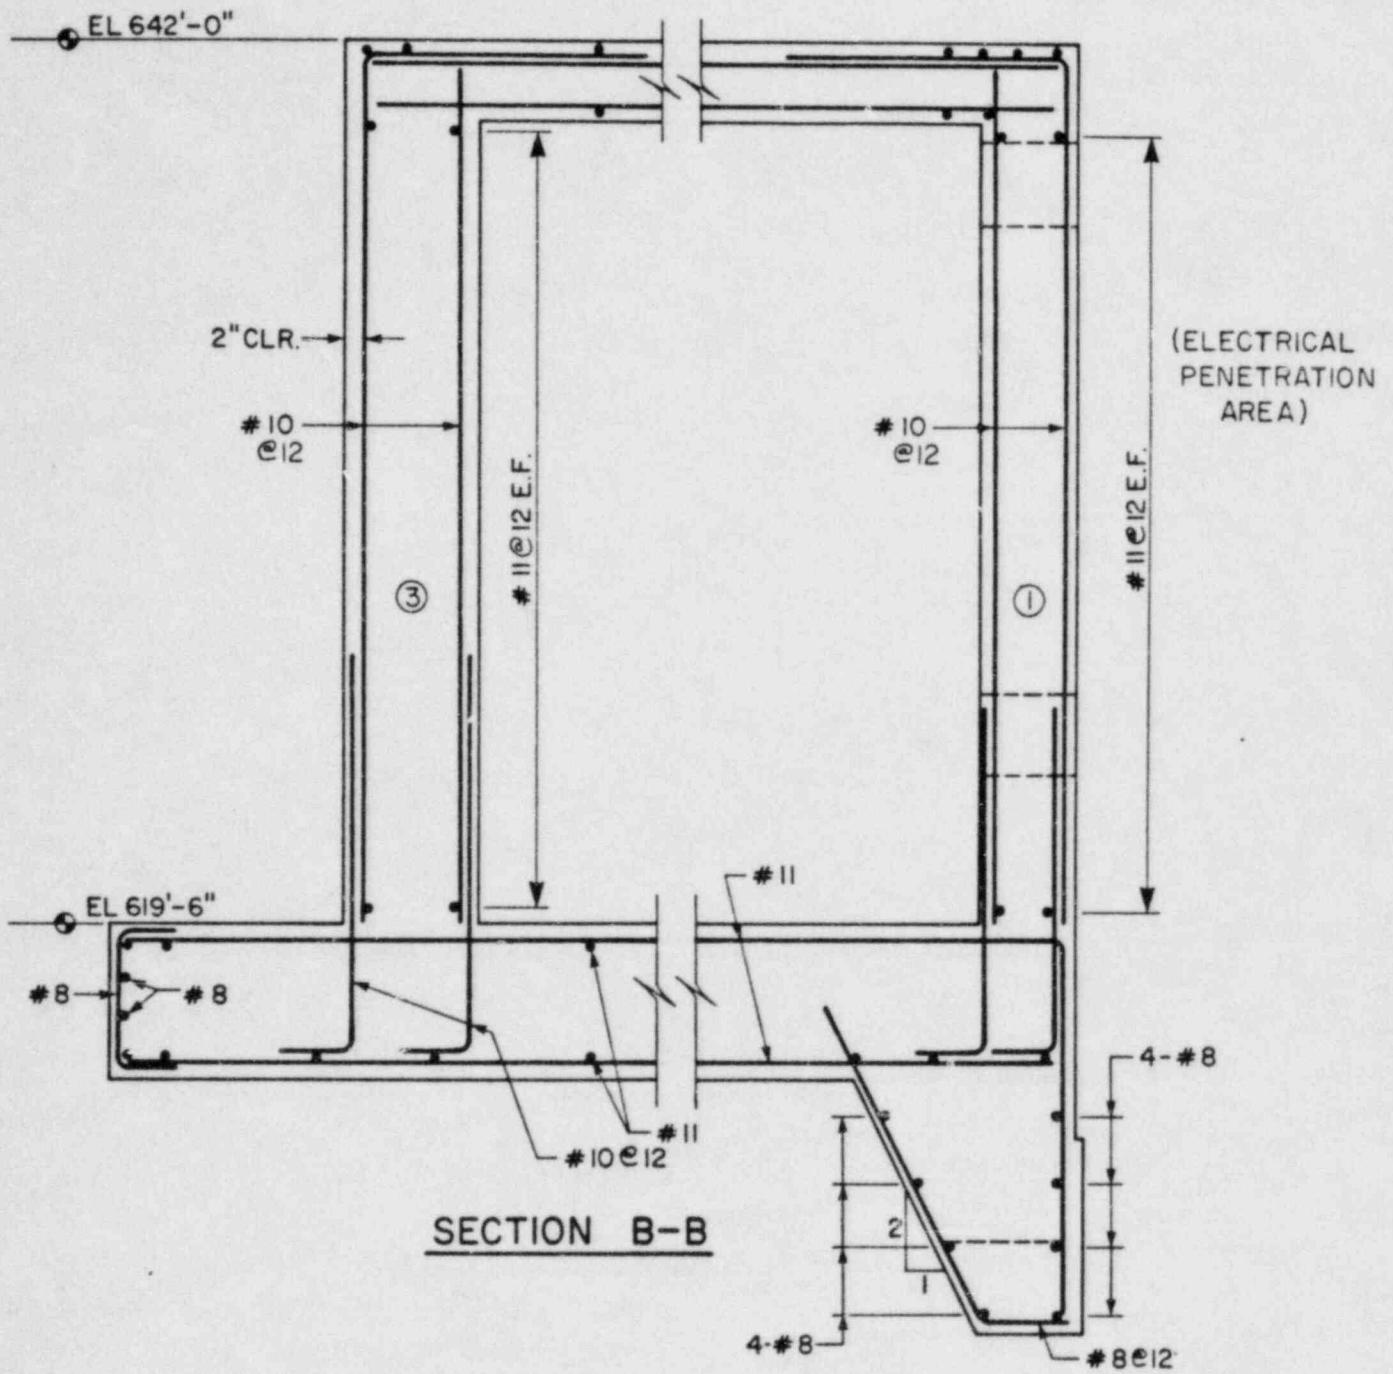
Reinforcement in Feedwater Isolation Valve Pit Walls 1 and 3 - Vertical Section
